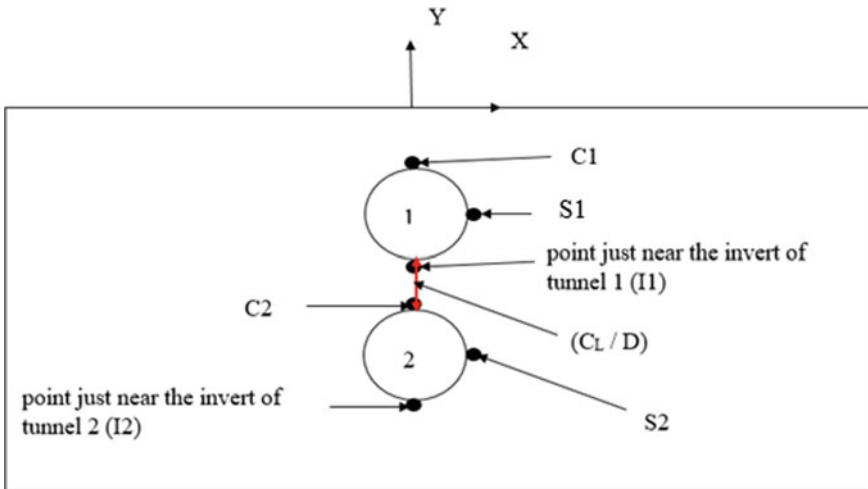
Layout of geometry of vertical twin tunnels (not to scale)
